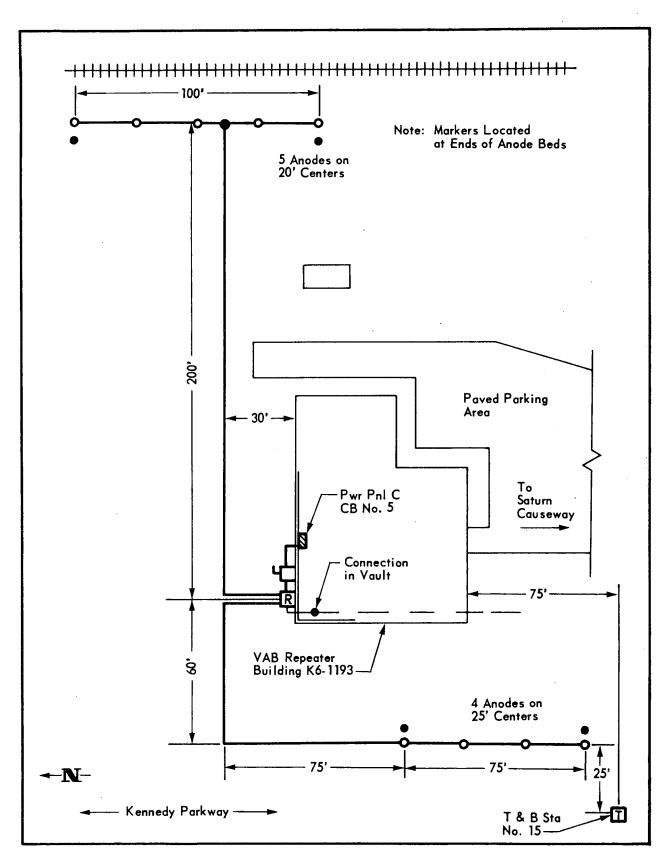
Site No. 5 and Test and Bond Station No. 15
